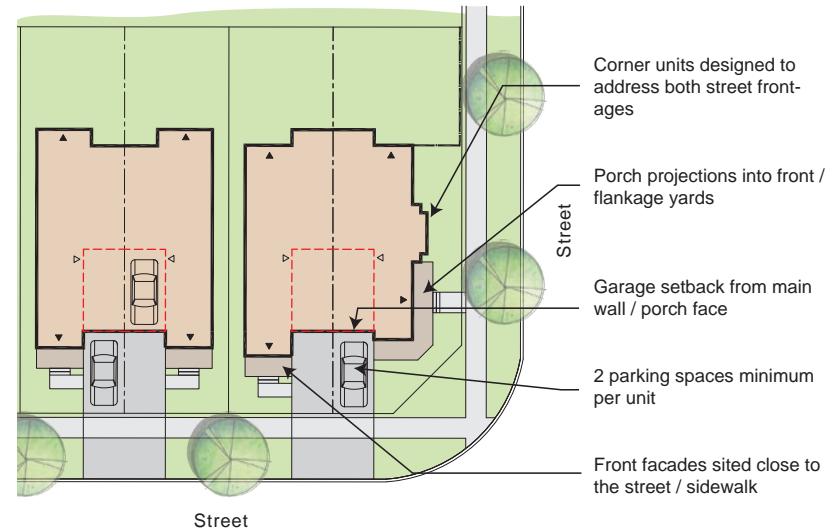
Conceptual plan layout for semi-detached dwellings
